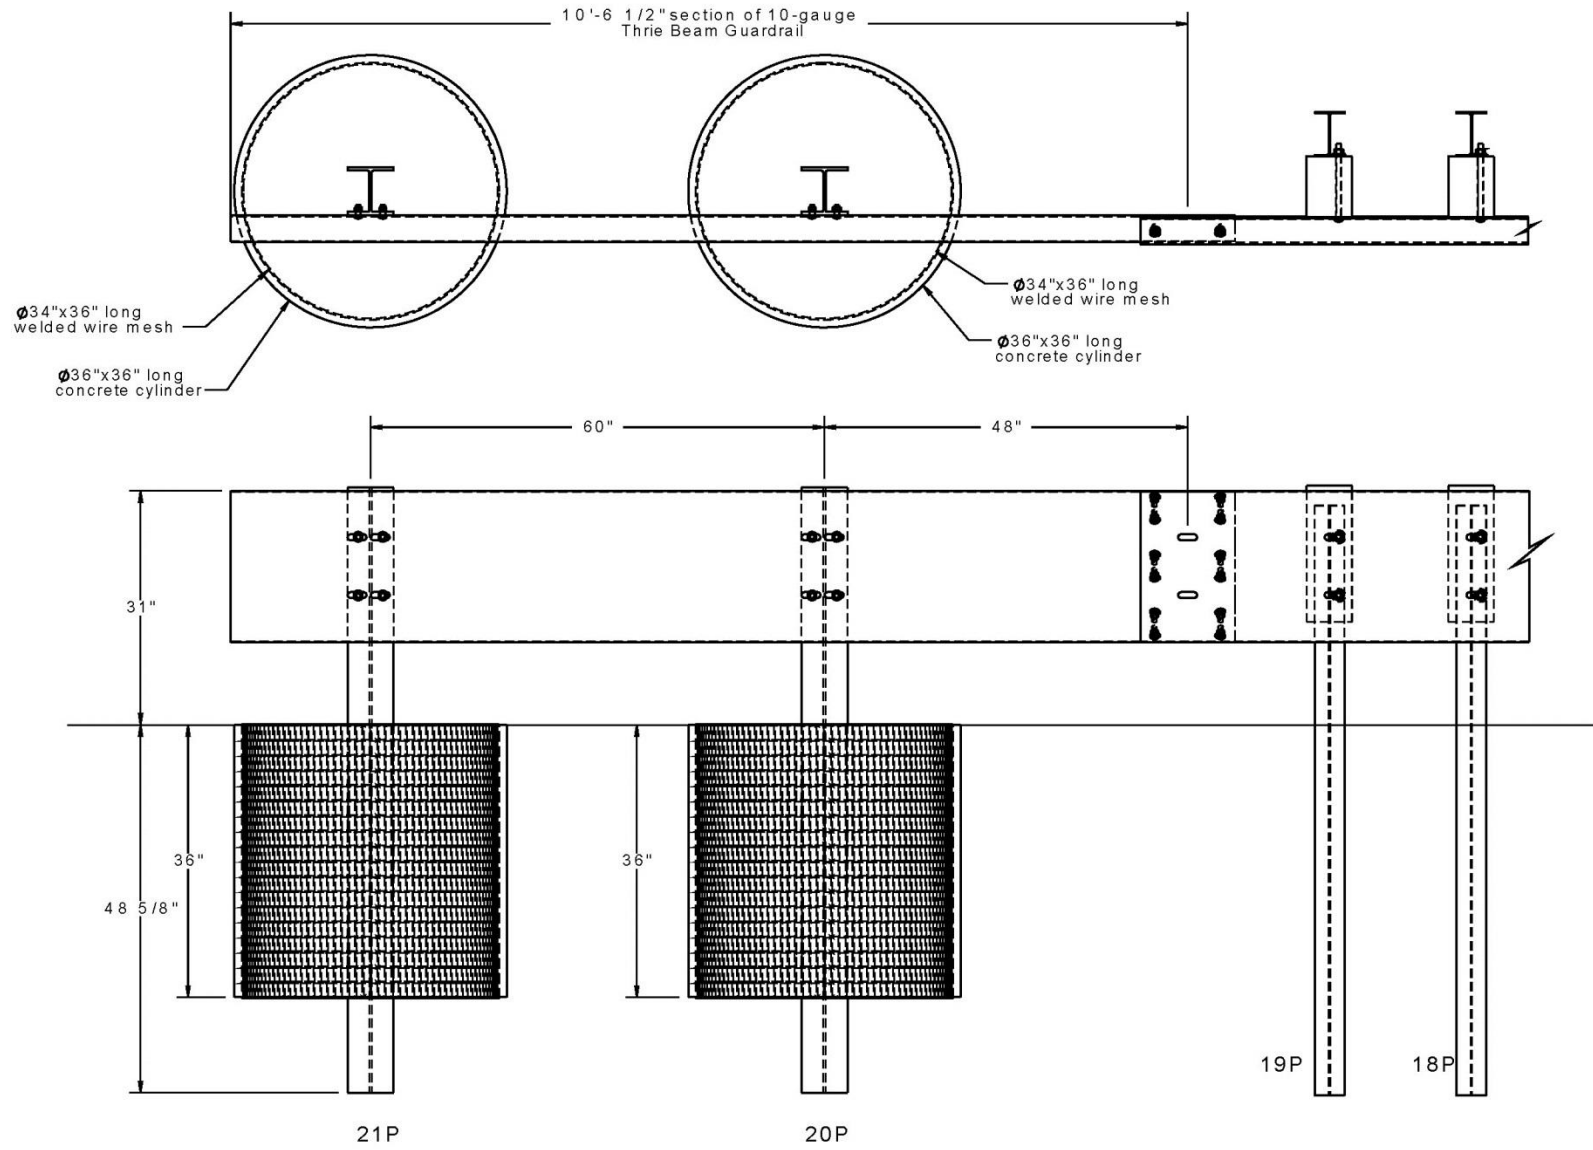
Stiff Bridge Rail Details, MwRSF Short Radius Design [14]
